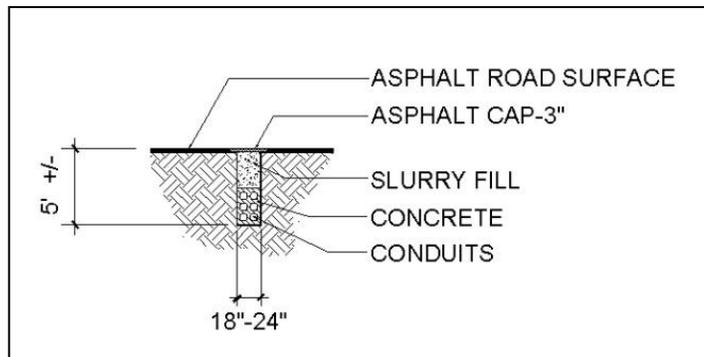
UNDERGROUNDING DIAGRAM
